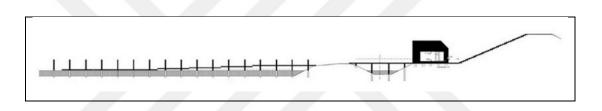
Section of the bunker 599 showing the inside cutting and wooden pathway leading people to a flooded area [66]
